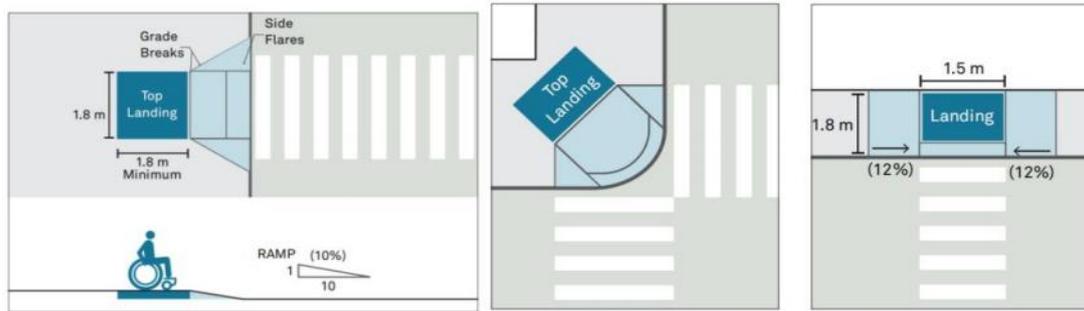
Diagram of Pedestrian Ramps(Source: Global Street Design Guide)
